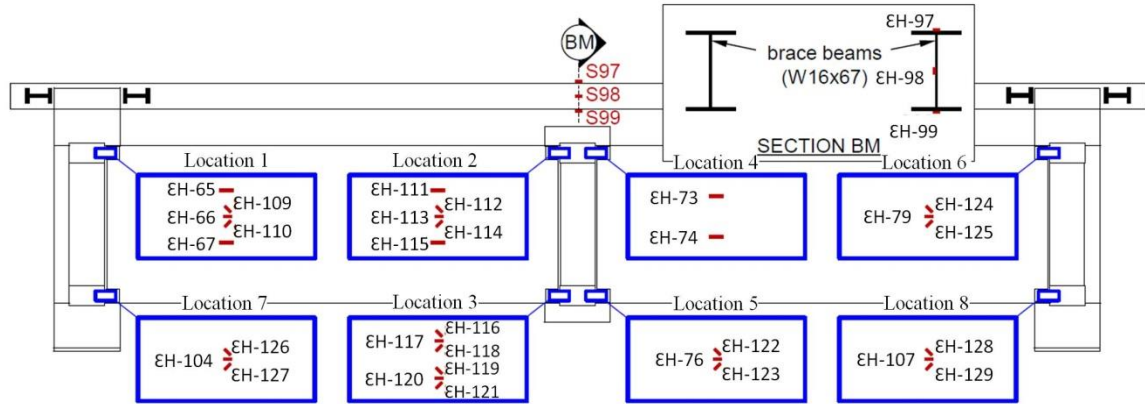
Location of strain gauges on link steel plates and upper brace steel beam
